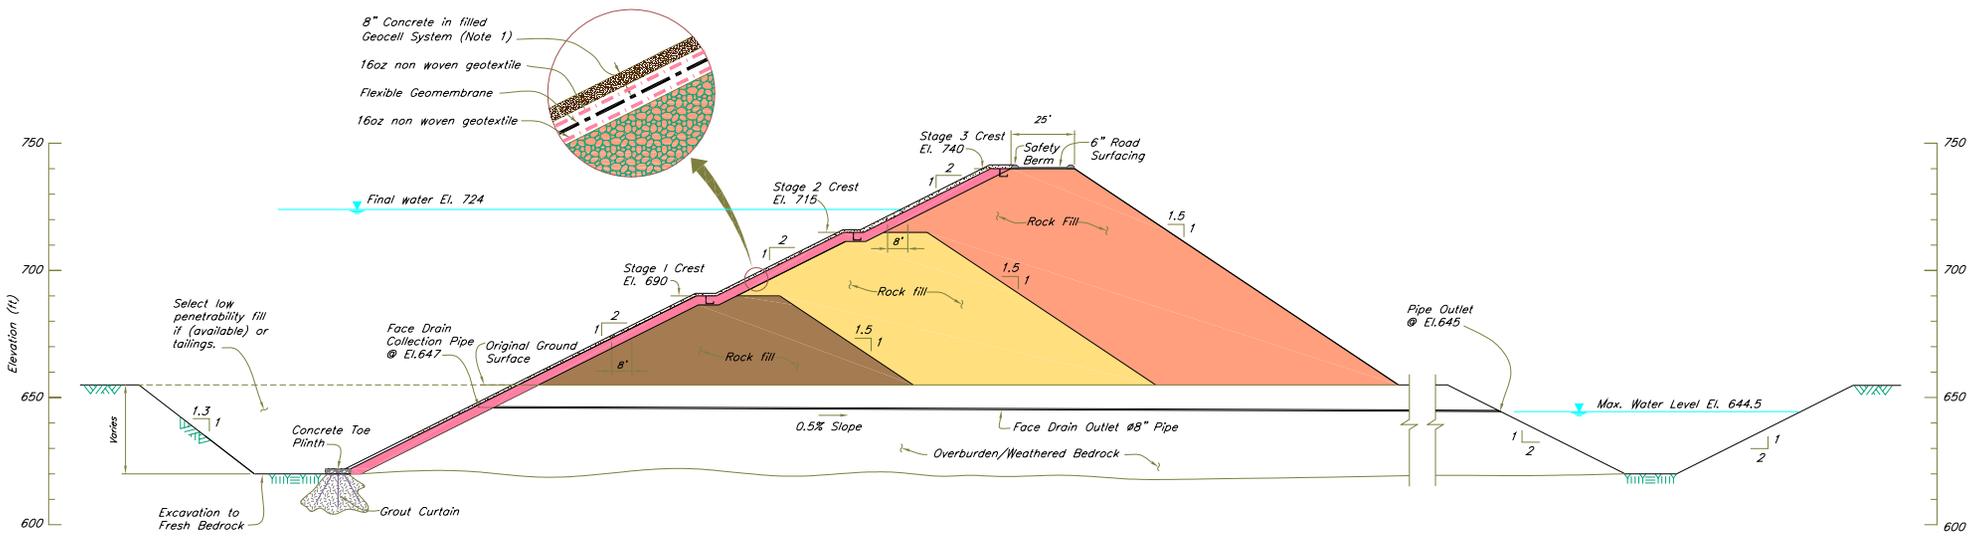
TSF Embankment Cross-Section Preliminary Design (looking East)
